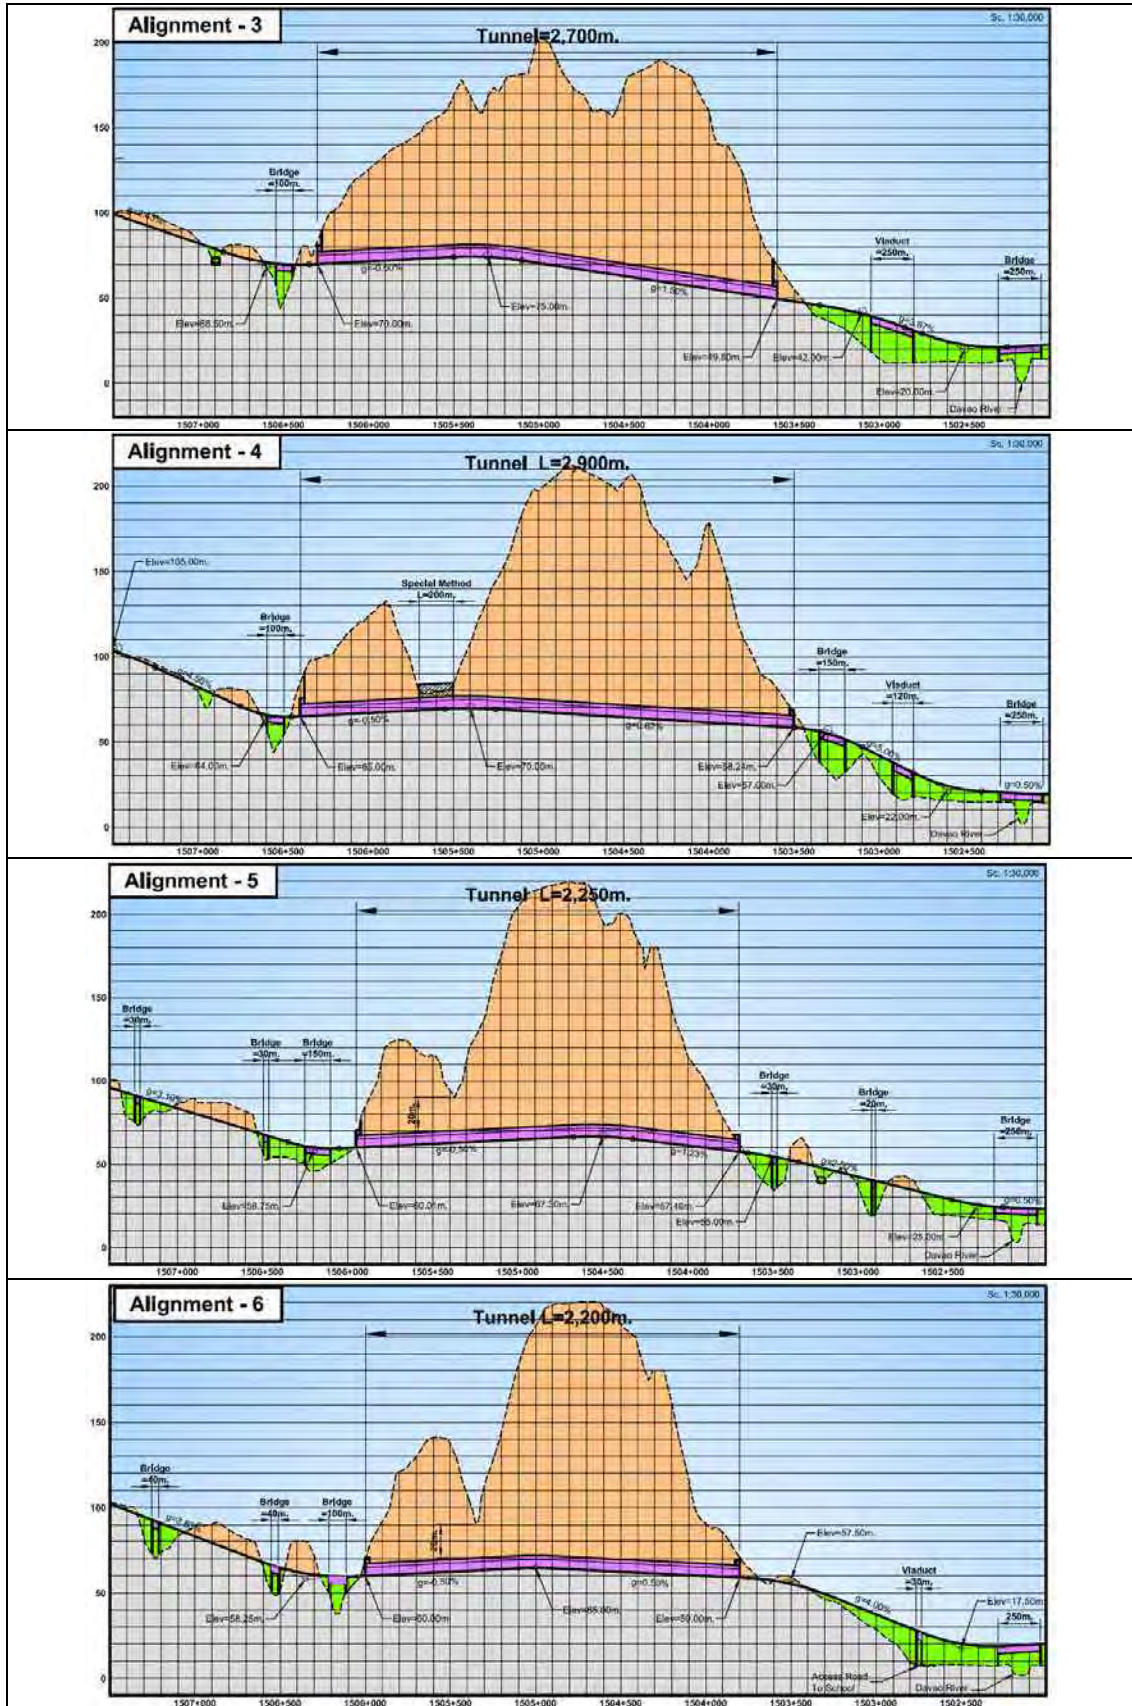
PROFILE OF TUNNEL SECTION
